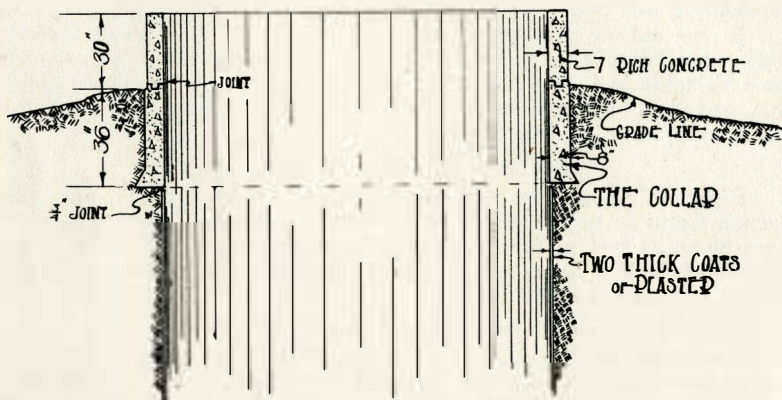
A CONCRETE COLLAR FOR THE PIT SILO
